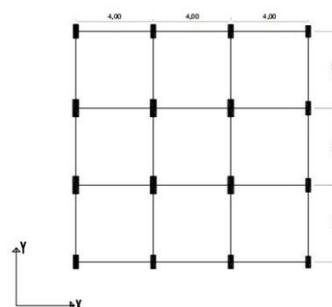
structure and story RC structure is 12 m by 12 m in plan
